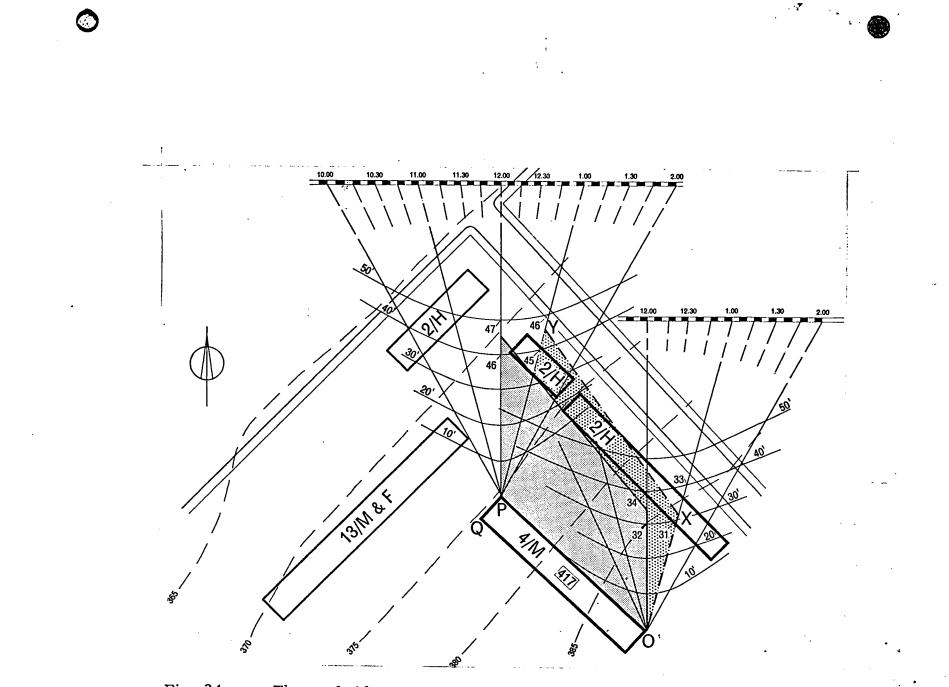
The roof ridge or parapet level of the building at O, less the ground level at any point, gives the height (h) of the building above that point.
